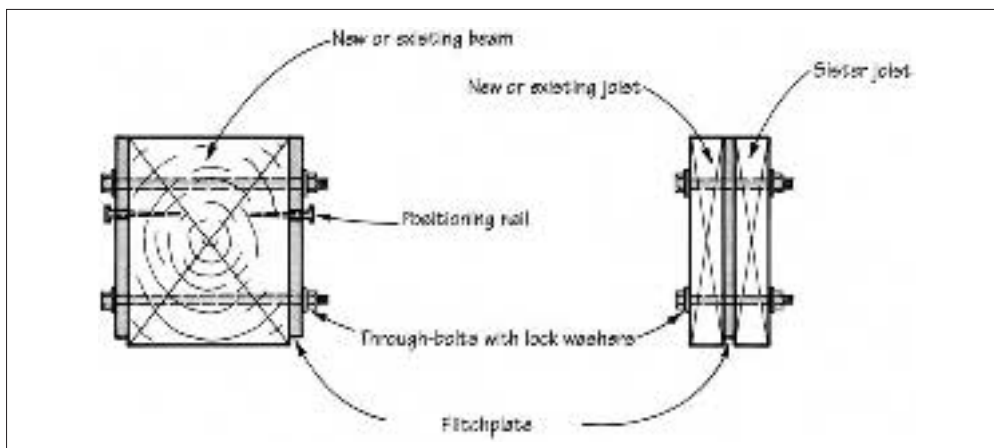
Fitchplates are particularly useful in renovation to reinforce sagging or broken wood beams. Use pairs of through-bolts spaced 16 to 24 inches on-center to make the connection.
